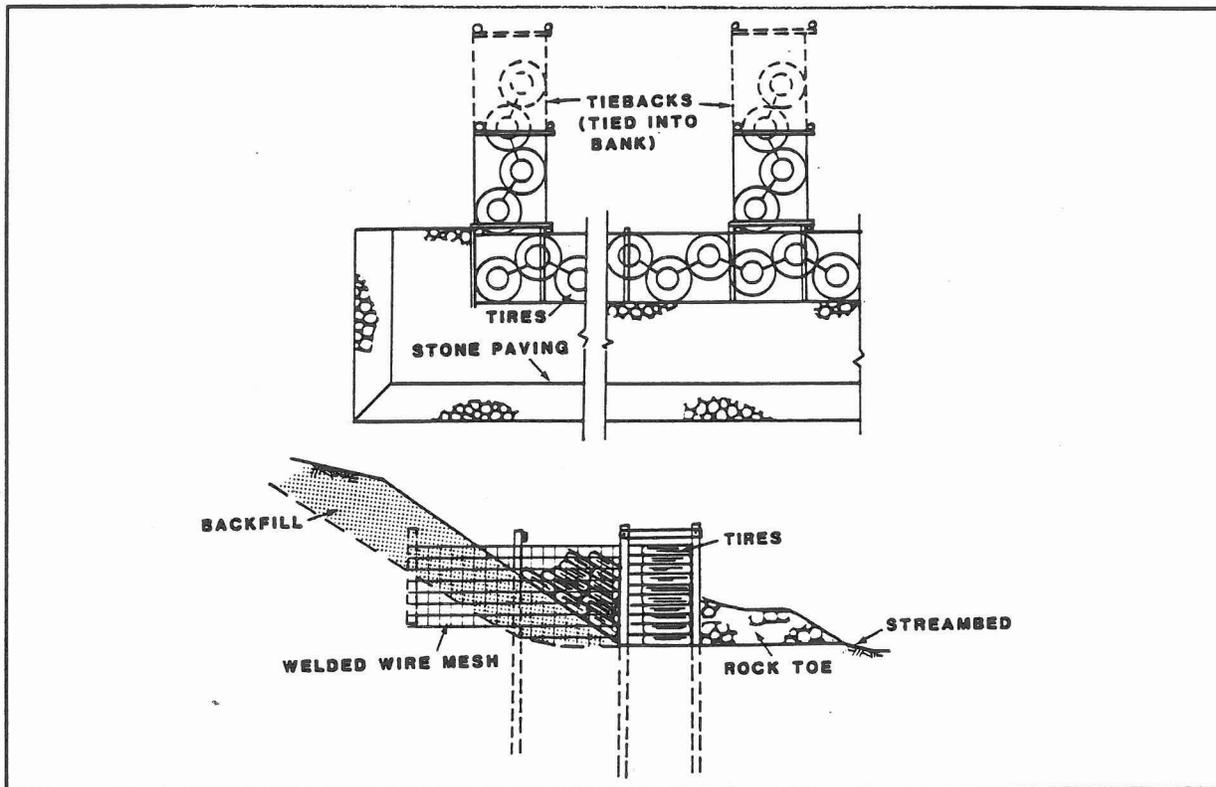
Timber pile, wire mesh crib dike with tiebacks (Modified from U. S. Army Corps of Engineers, 1981; After [37]).
